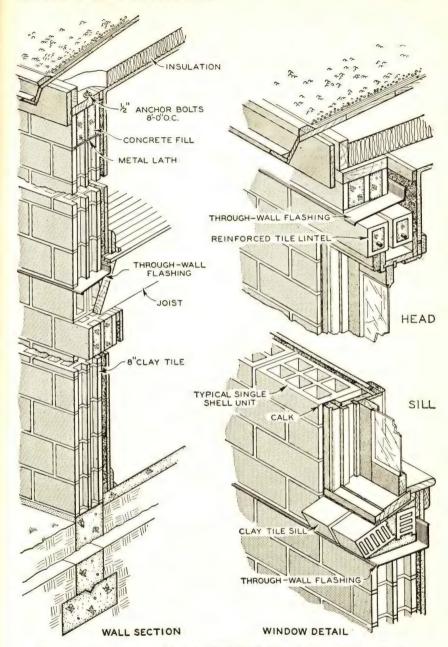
Pictorial View and Details of Tile Wall Built of Units Shown in Fig. 21
